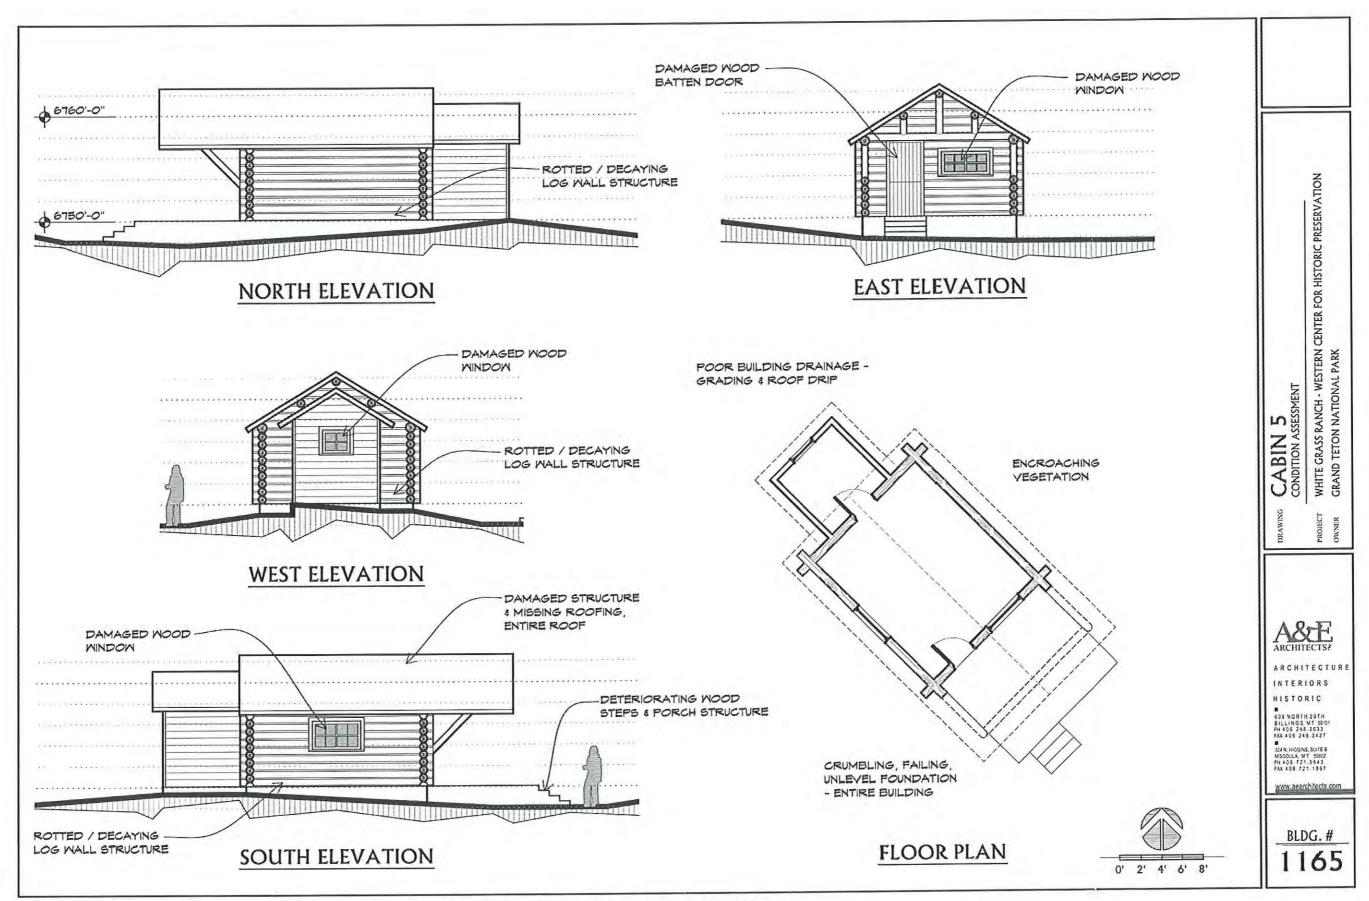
Existing conditions plan and elevations of HS-1165, Cabin 5, showing areas of deterioration (A&E: 2006).
